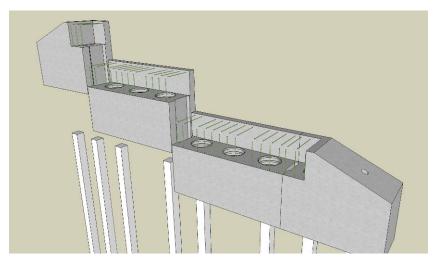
Prefabricated Integral Abutment
